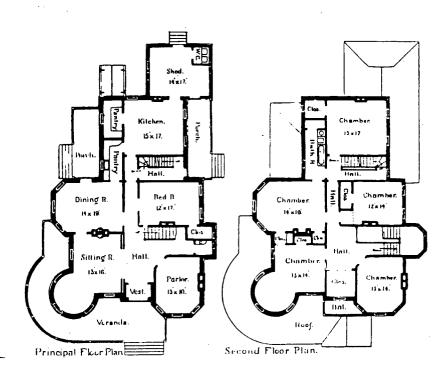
J. H. Kirby, Plan, Design 25. (Modern Cottages, 1886).
